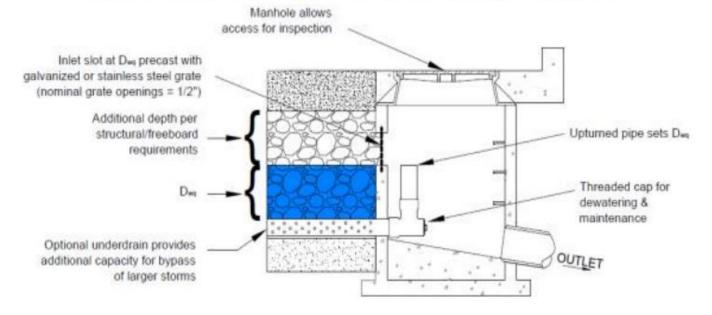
Permeable Pavement Example: Outlet for Infiltration System (NCSU-BAE)
